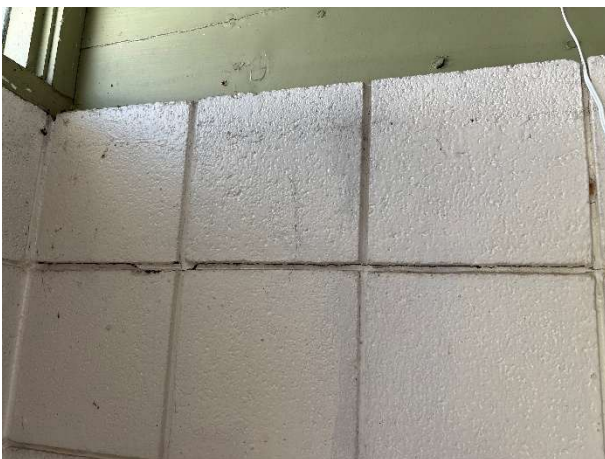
Bulk Water Distribution Building Worn Out Wall Caulking
